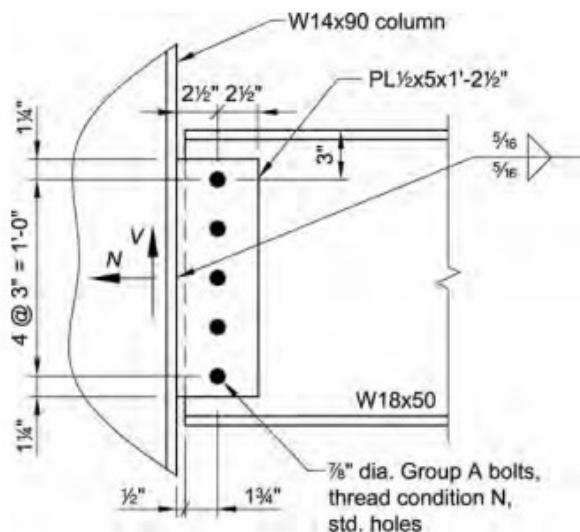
Single-Plate Connection Subject to Axial and Shear Loading (Beam-to-Column Flange)
